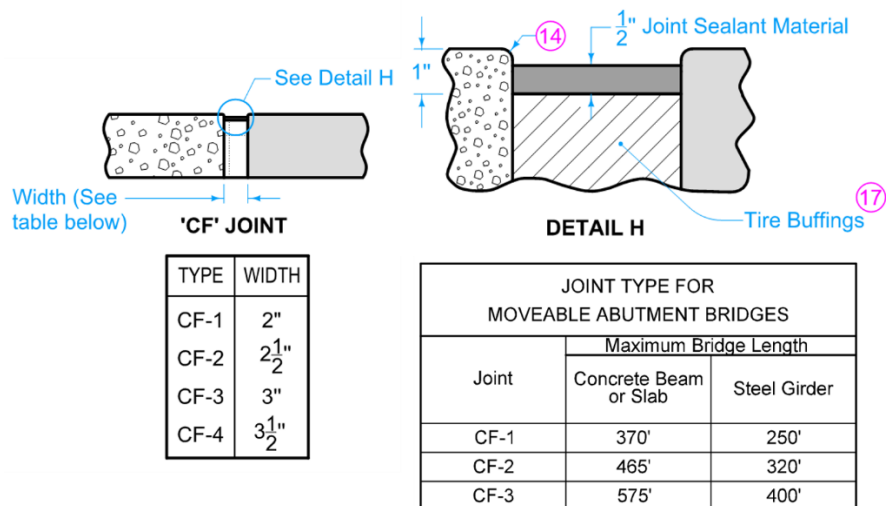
Schematic showing CF joint according to Iowa DOT standards (IowaDOT Standard Road Plans).
